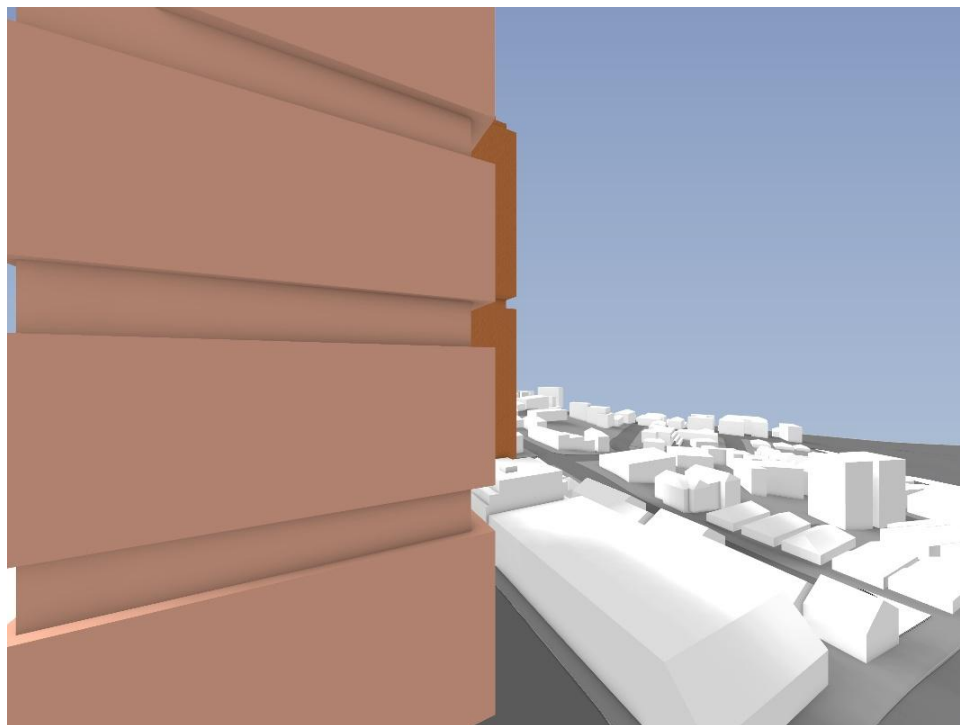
Eastern elevation, fronting Oxley Street - Level 16 (Source: COX Architecture)
